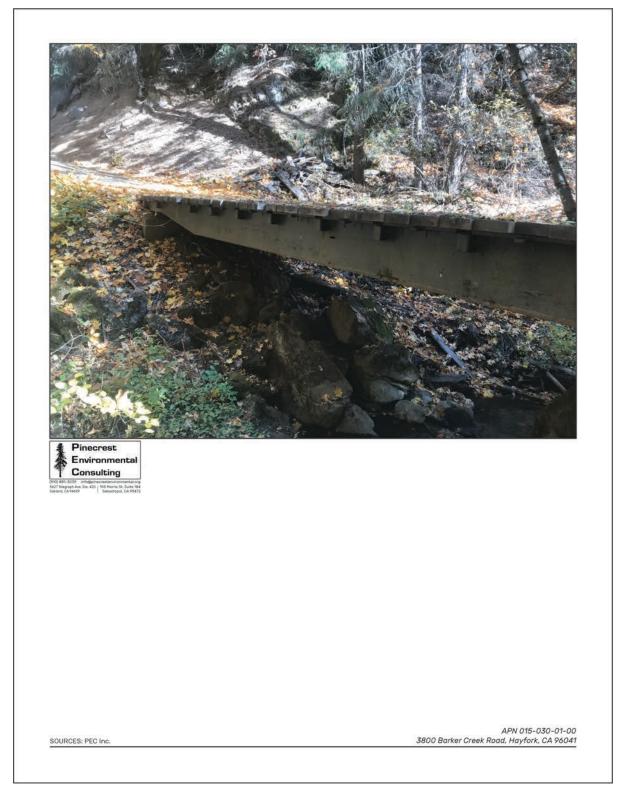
PHOTOGRAPH OF BRIDGE - DOWNSTREAM
